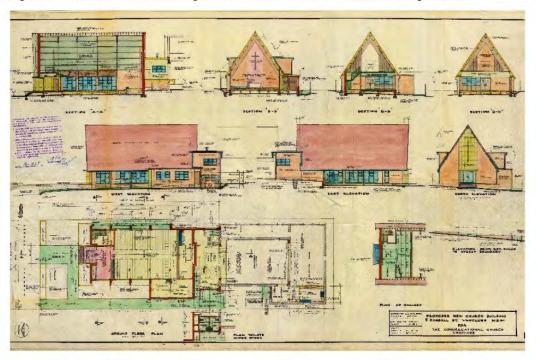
Original 1960s plans of A-frame church building (Source: Woollahra Council)
